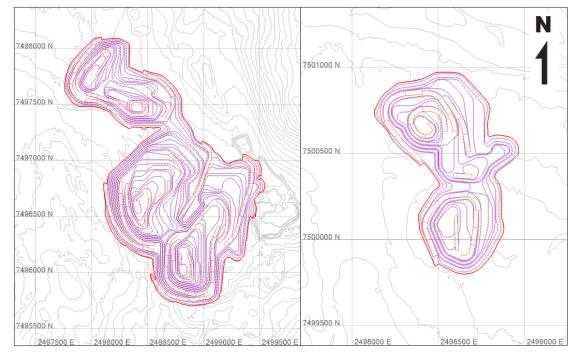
Hannukainen (left) and Kuervitikko (right) Final Pit Design
